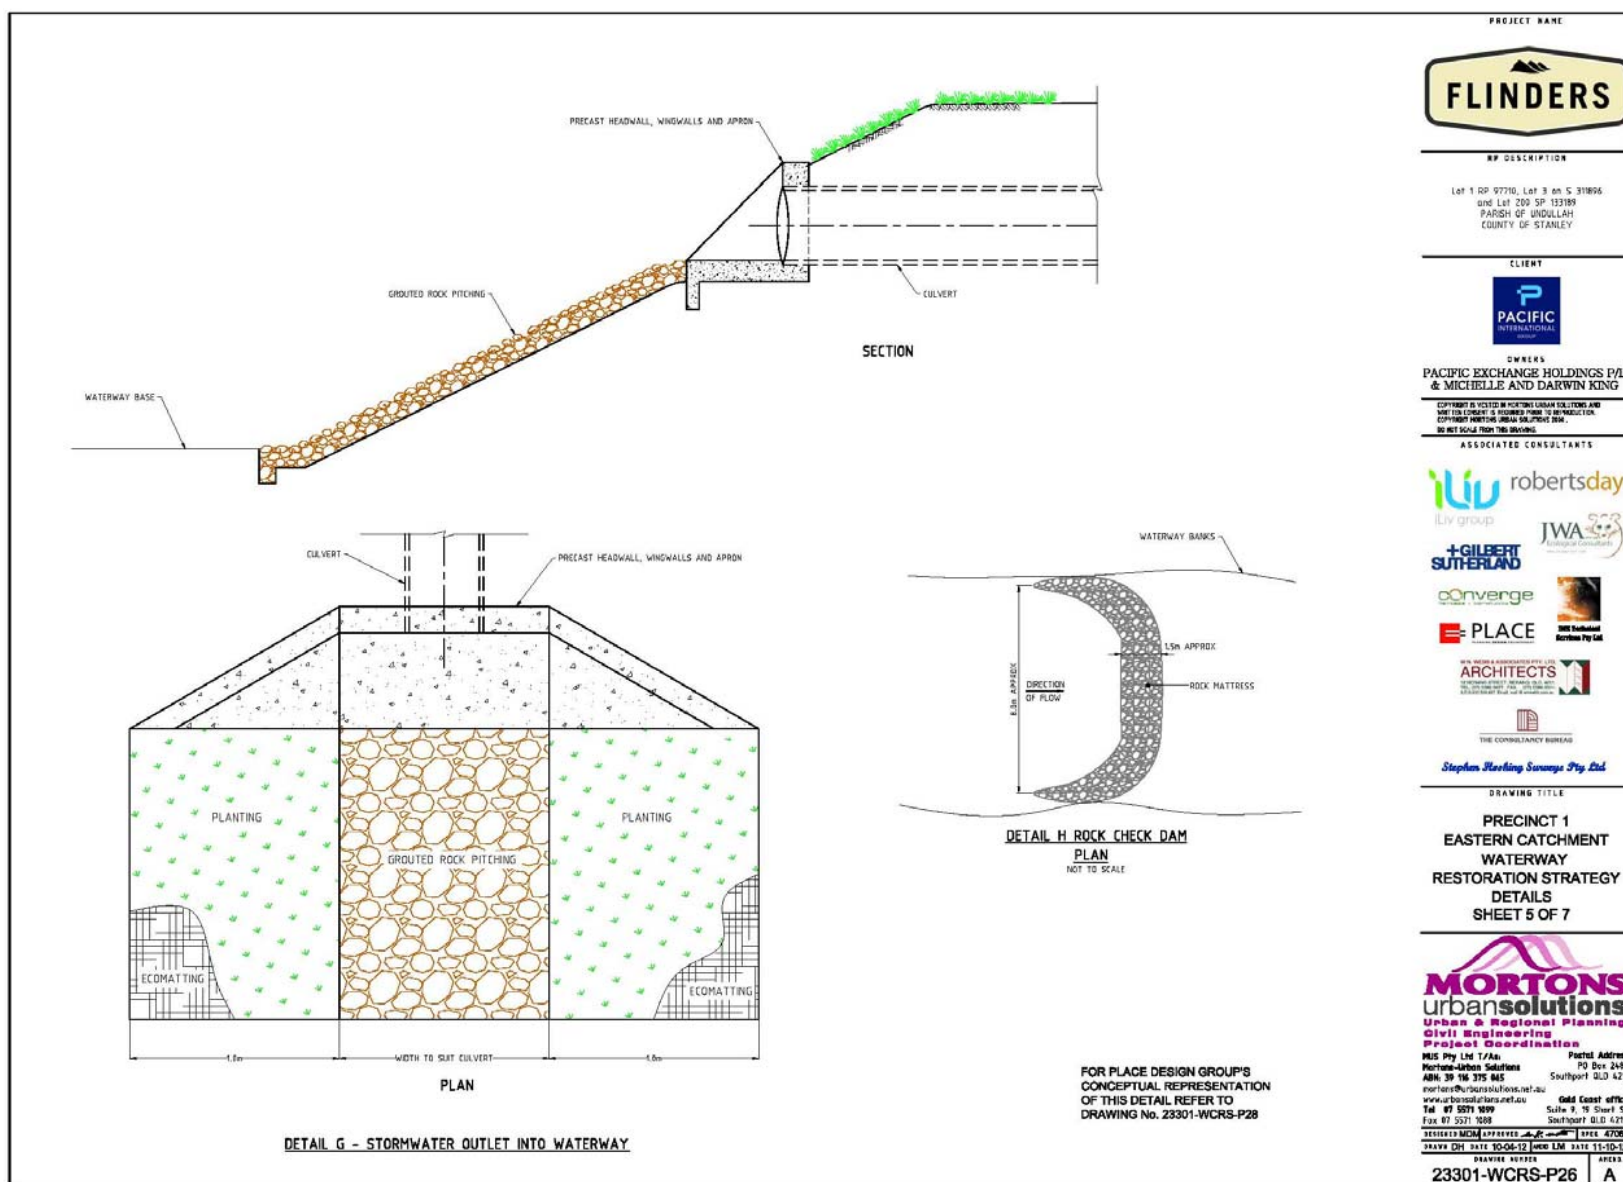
over the next seven pages shows typical concept details for the re-profiling of the unstable waterway banks within Precinct. These details are conceptual only and are subject to future detailed design and approval.
